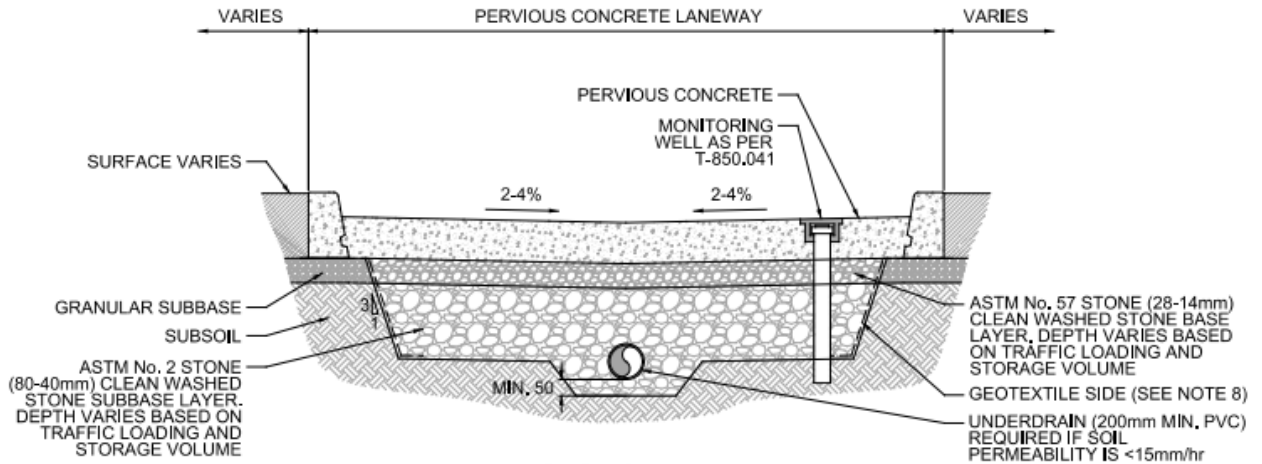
Material Sequencing in Typical Cross Section of Pervious Concrete Pavement
